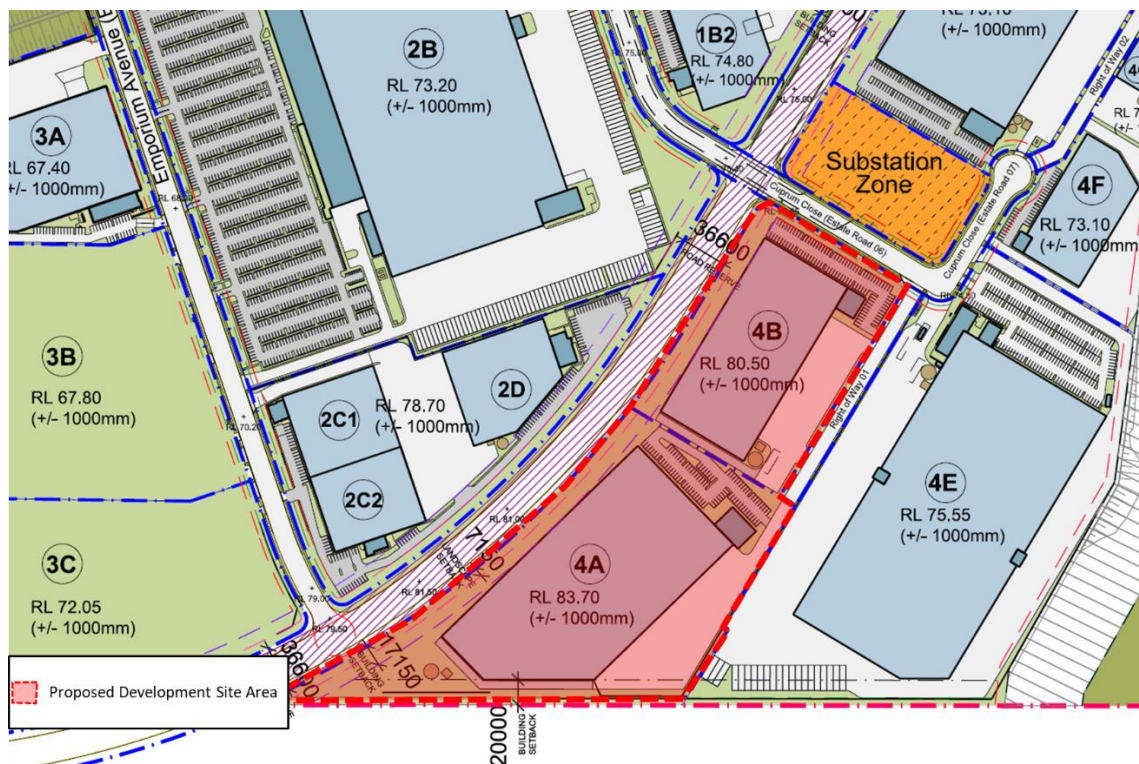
Proposed development site area 'the Site' (Source: OWE Estate Masterplan, SBA Architects)
